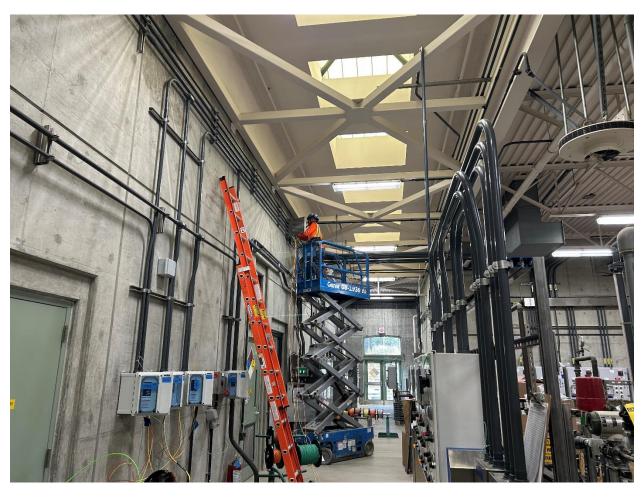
Electrician on scissor lift in Chemical Building pulling electrical wires into conduits and pullboxes.
